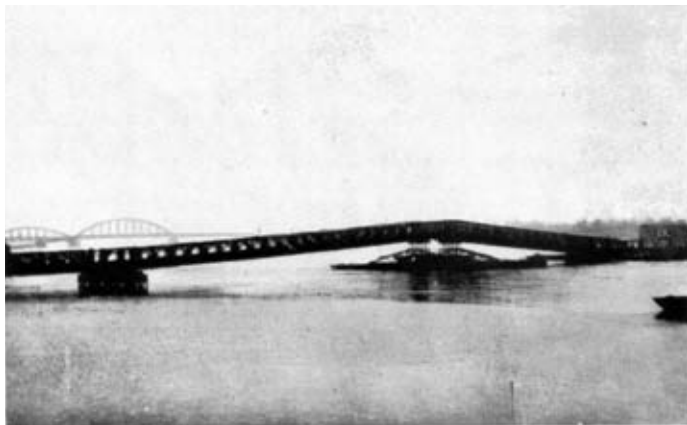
Floods at Kent Bridge. Pier for double landing bay in  $5\frac{1}{2}$ -knot current.
